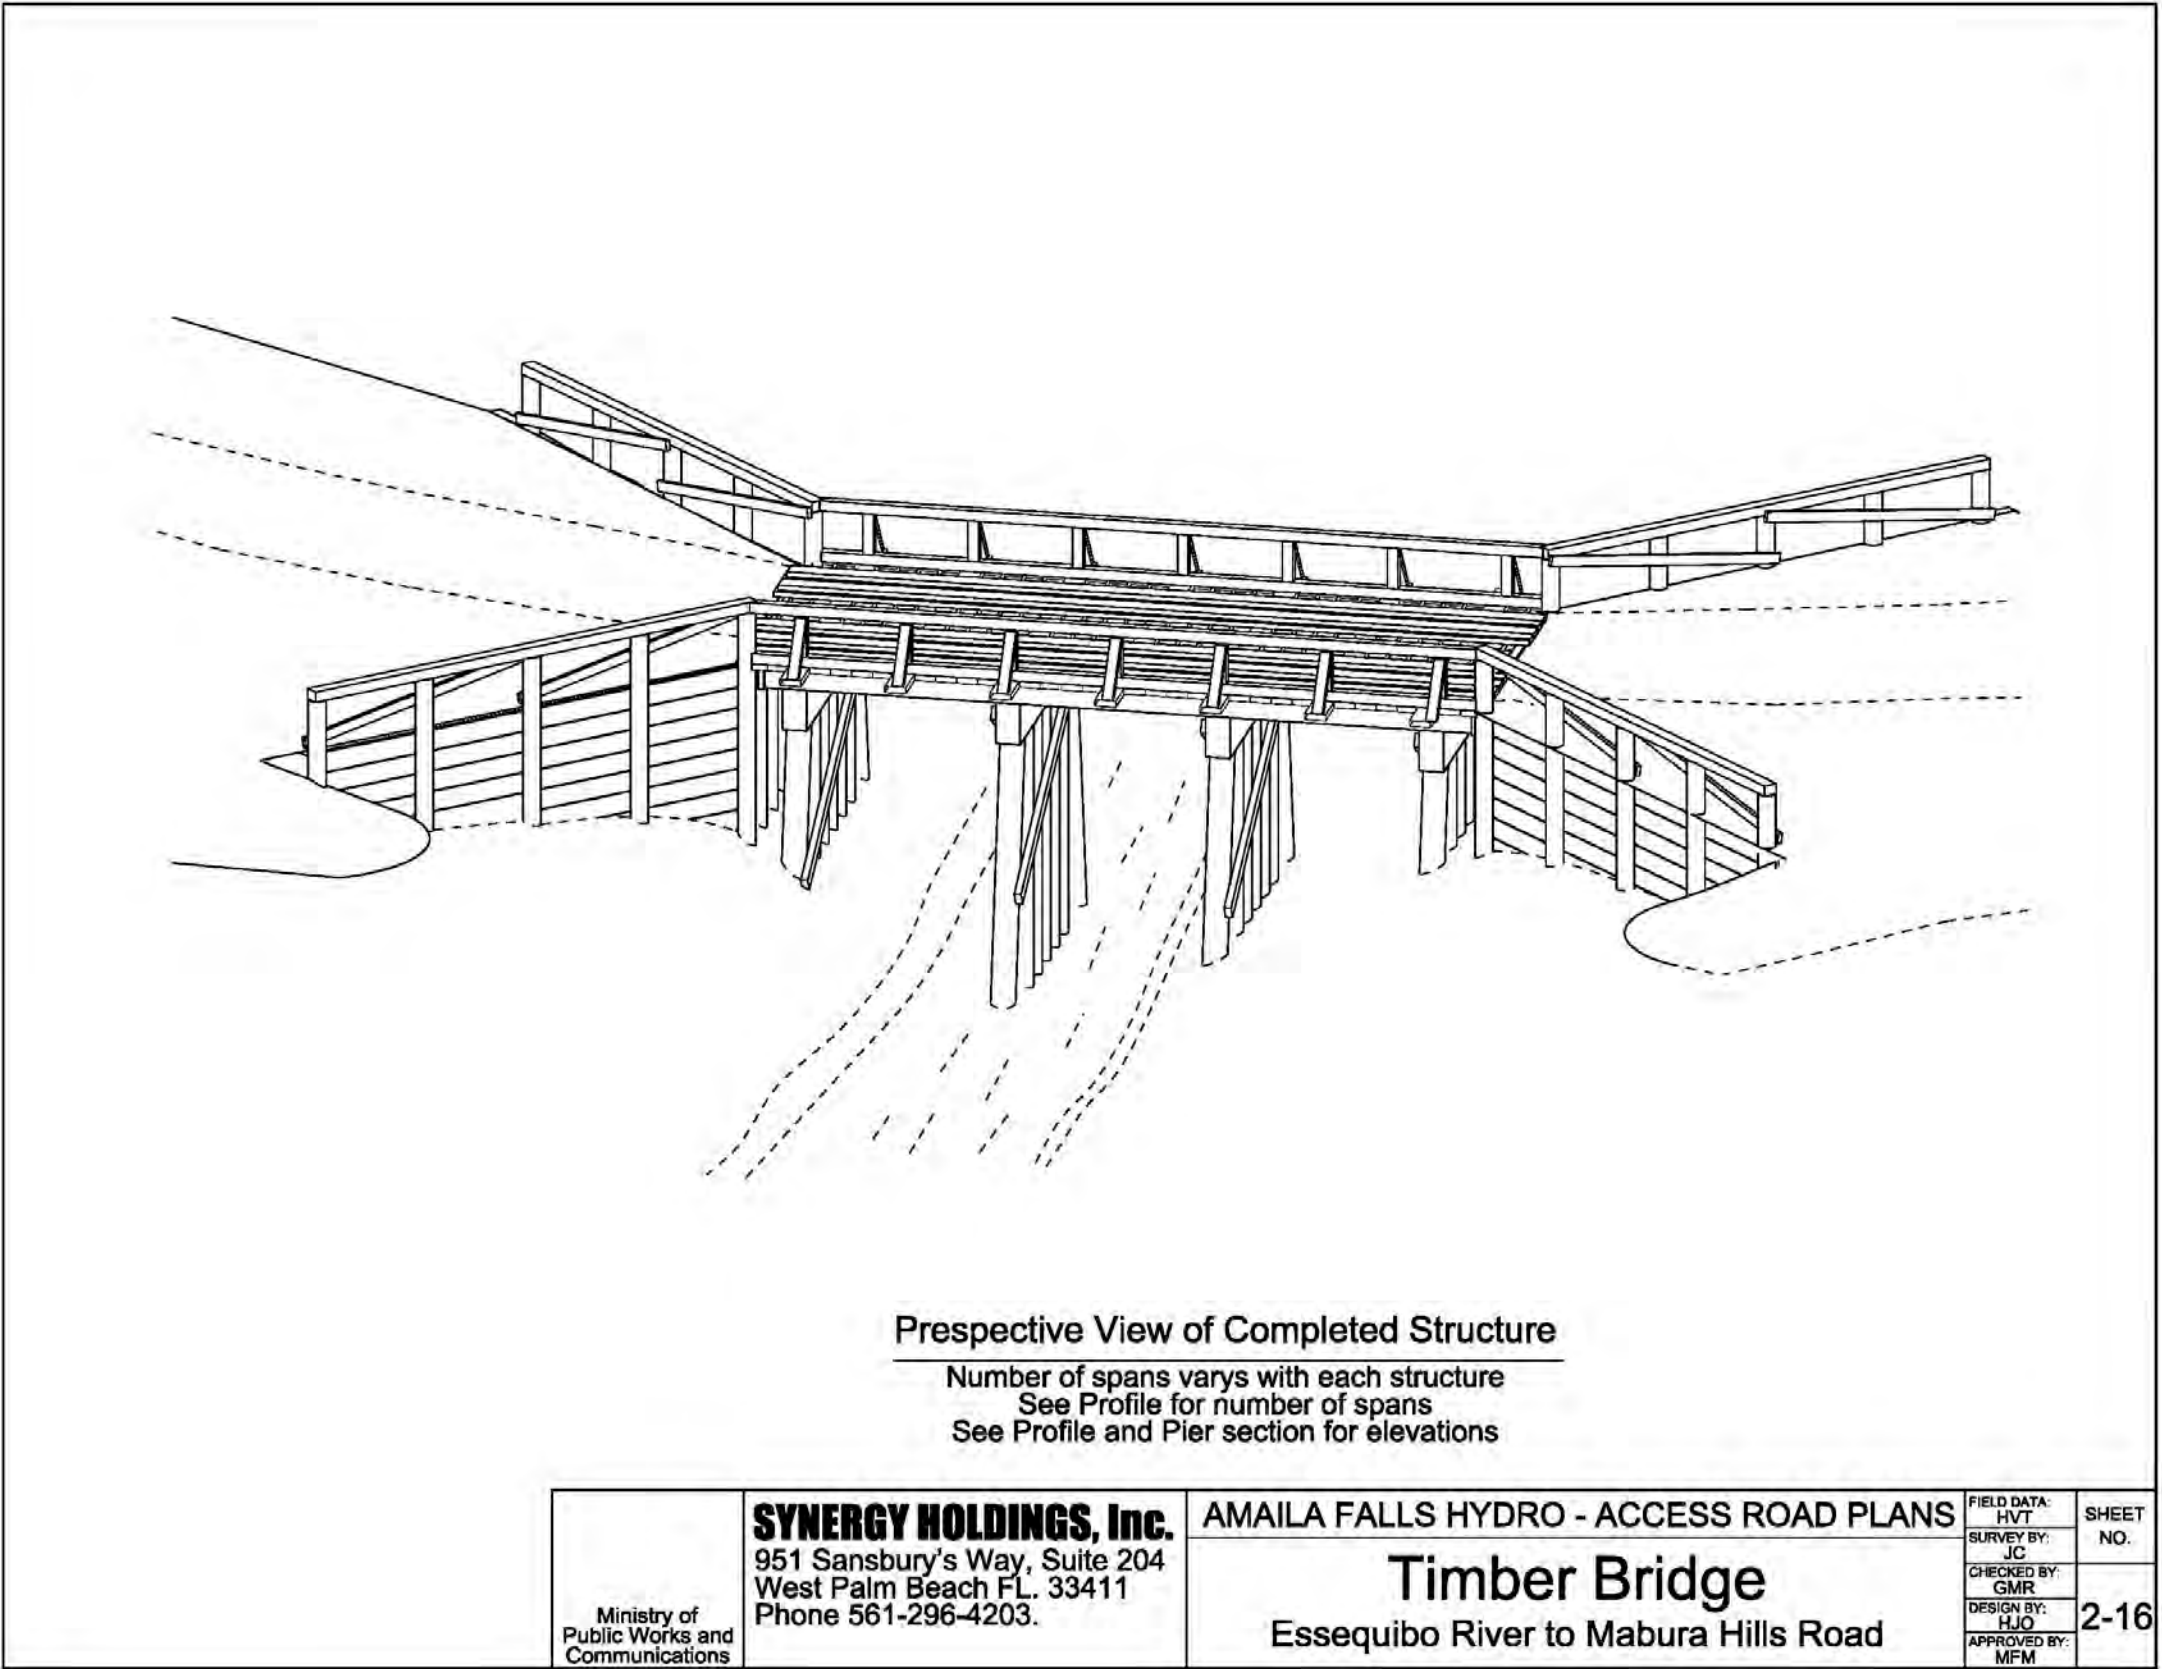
Timber Bridge, Essequibo River to Mabura Hills Road
